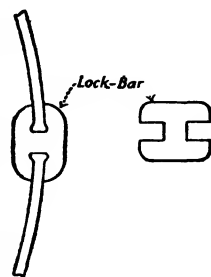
Lock-bar pipe. Longitudinal seams.
